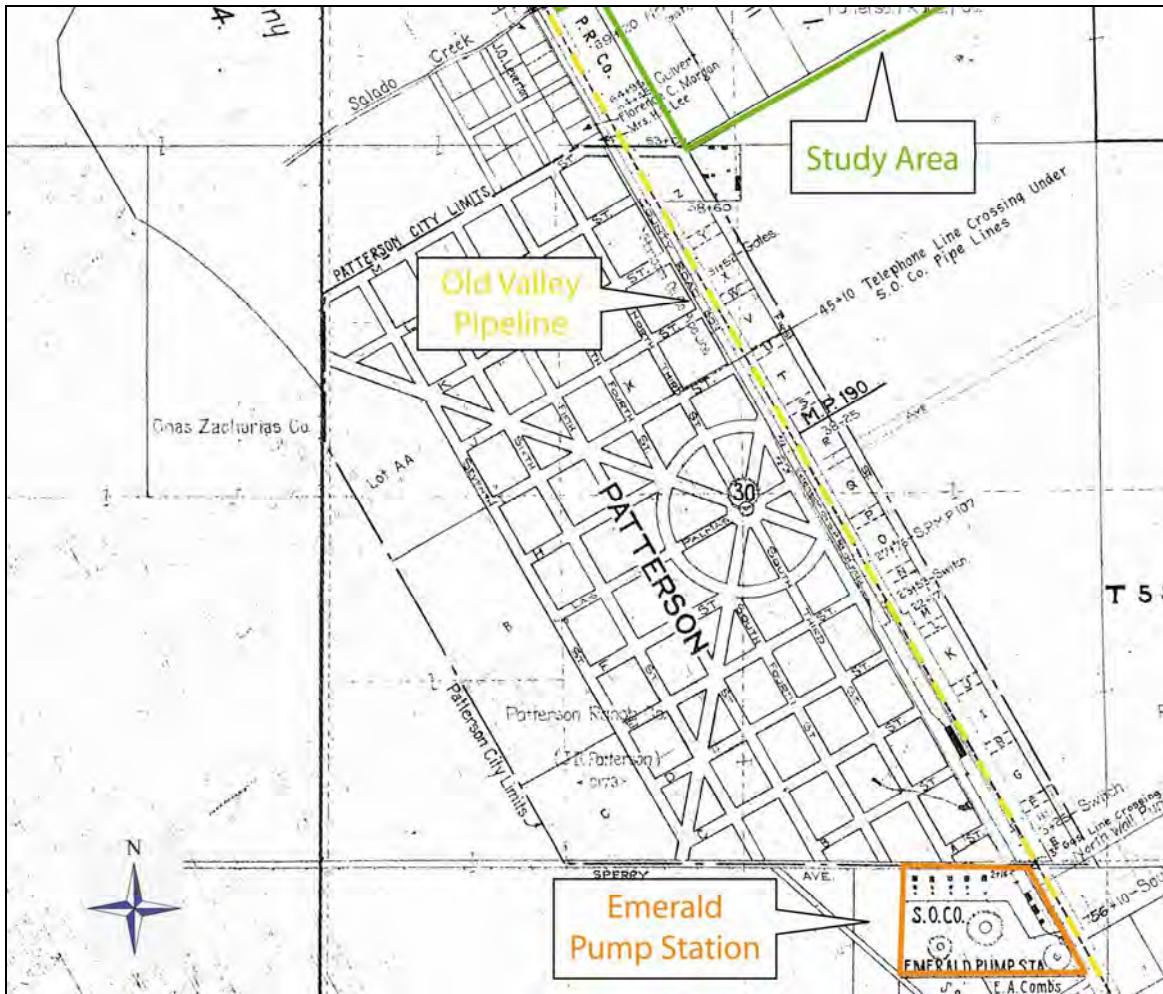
Detail of the Standard Oil Co. OVP As-Built dated 1933 Locating Pipeline and Emerald Station
